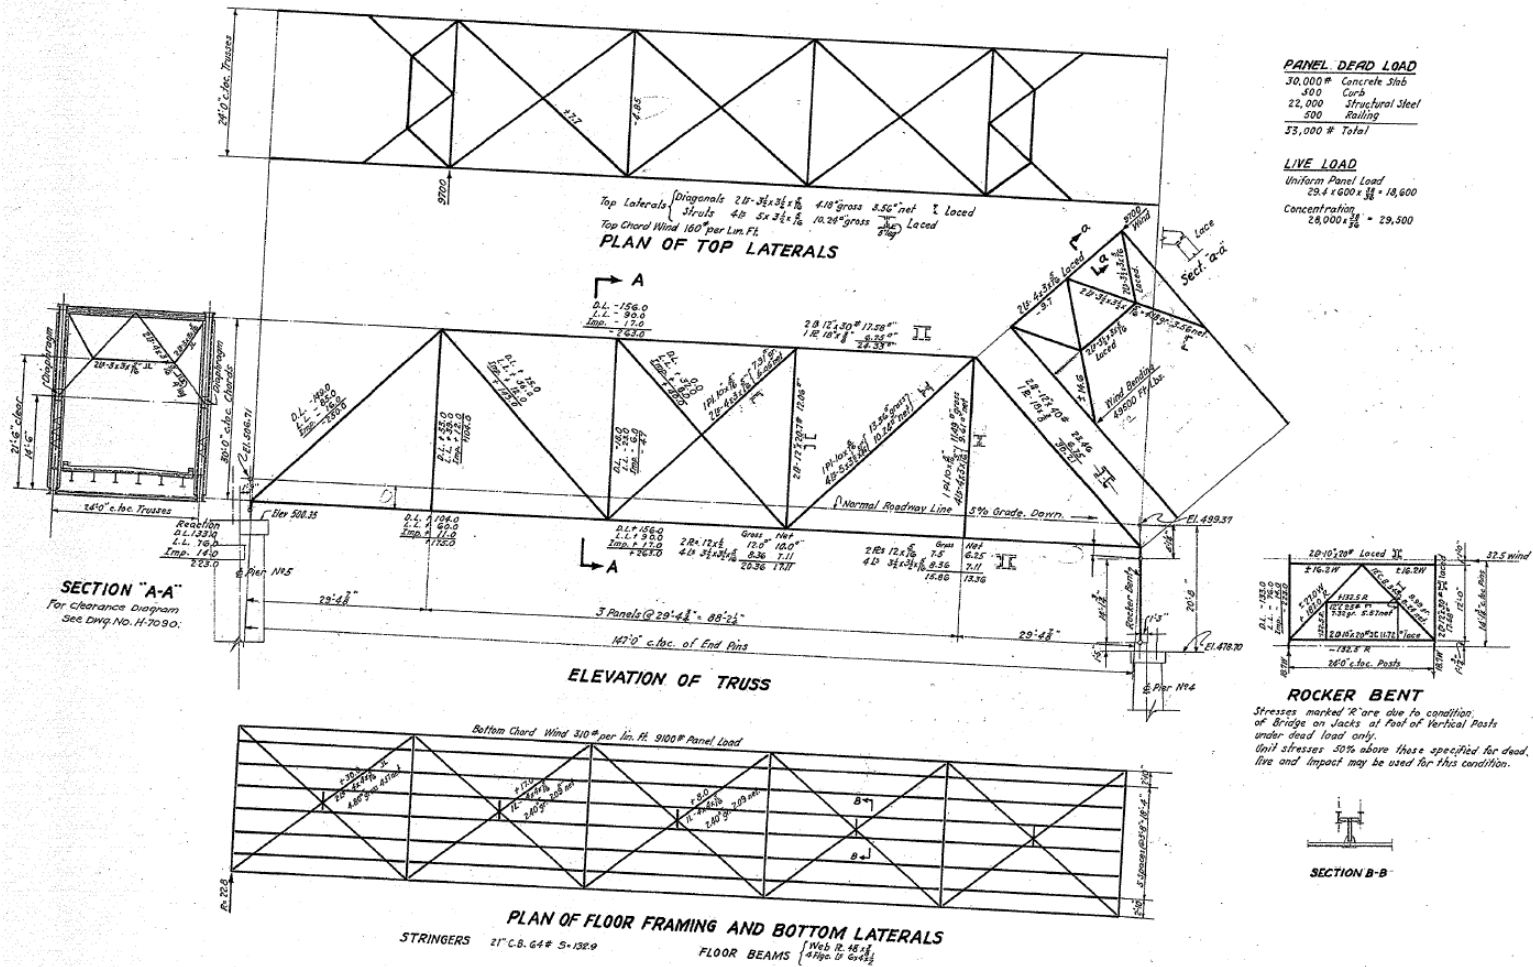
Dimensions and design loads for truss members. J.G. White Engineering Corporation (1928). Used under fair use, 2015.
